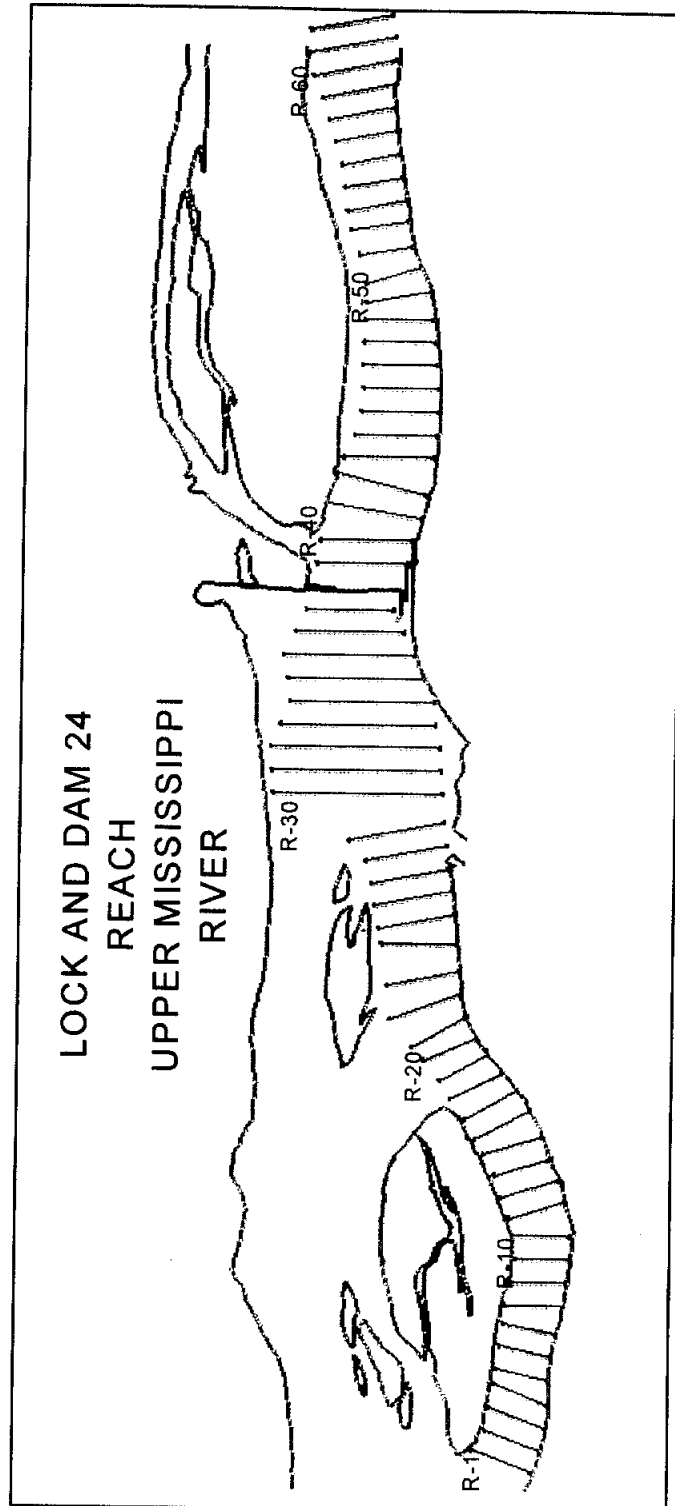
Lock and Dam No. 24 Model Plan View
